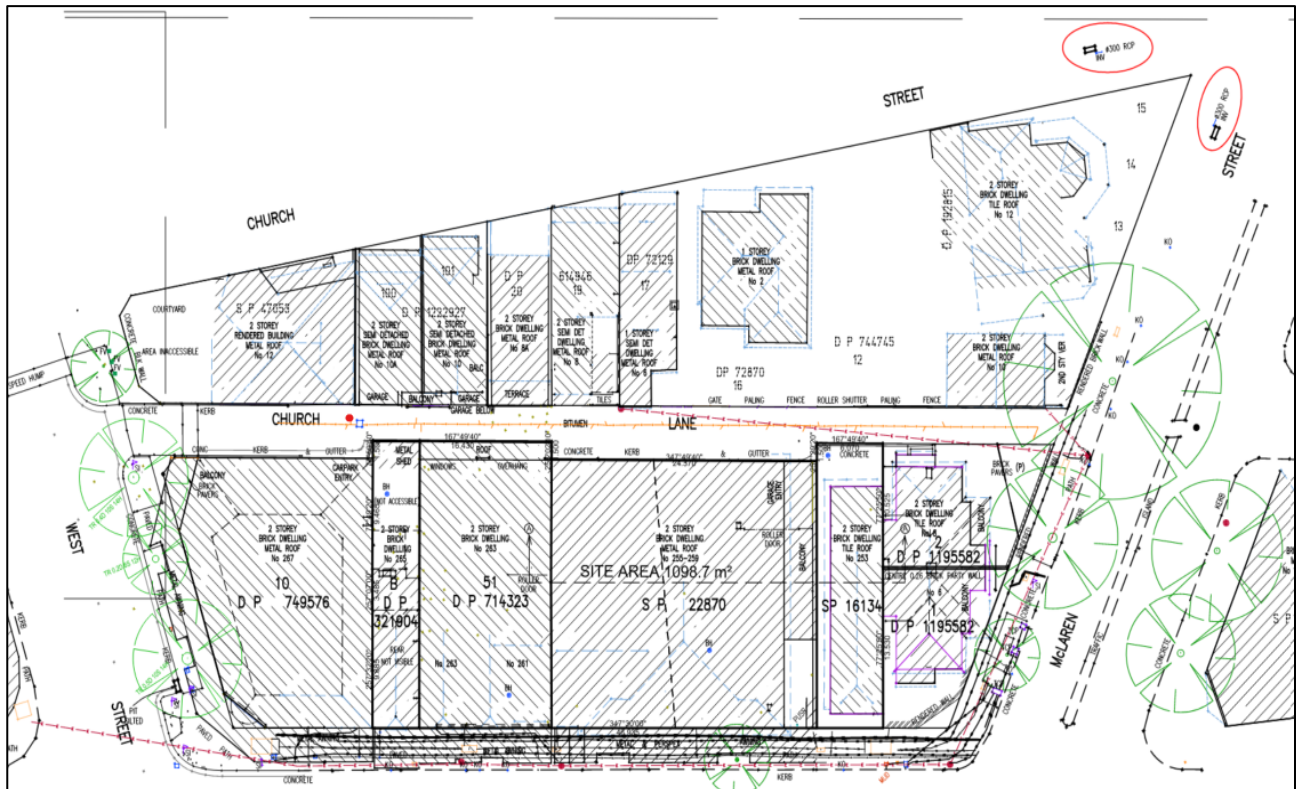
Site Survey Plan (Source: Linker Survey dated 12/02/2025)
